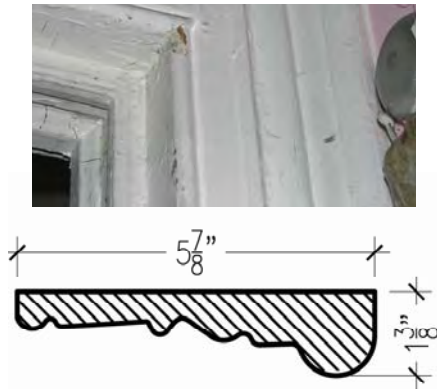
D102 casing molding type-3 photo and profile. (Photo: BBB, 2006)
